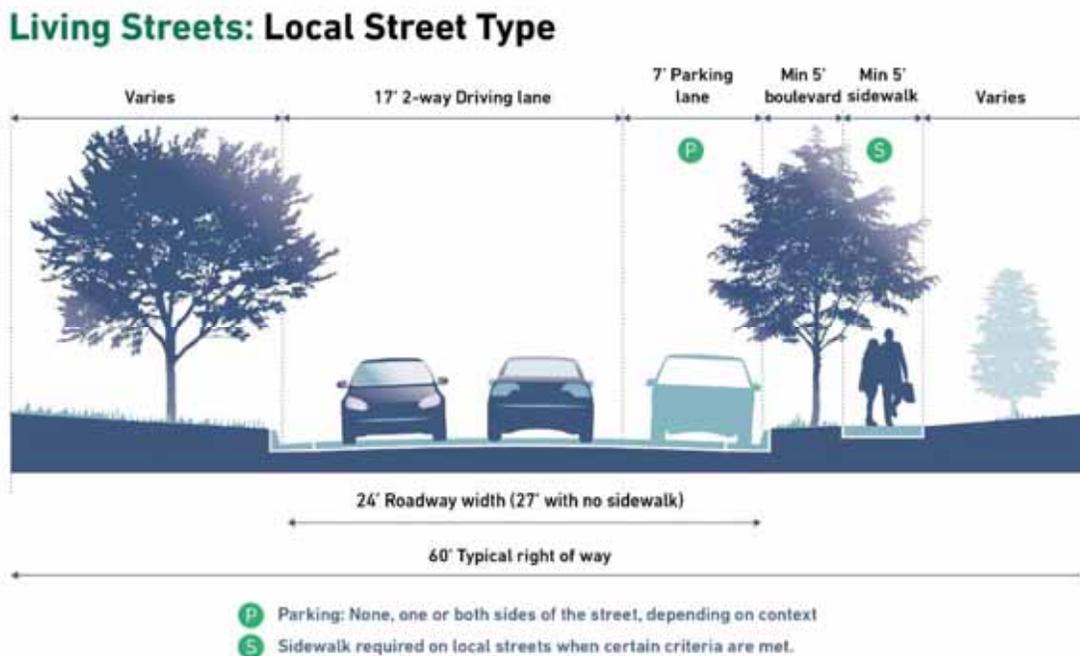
PROPOSED LOCAL STREET TYPICAL SECTION
